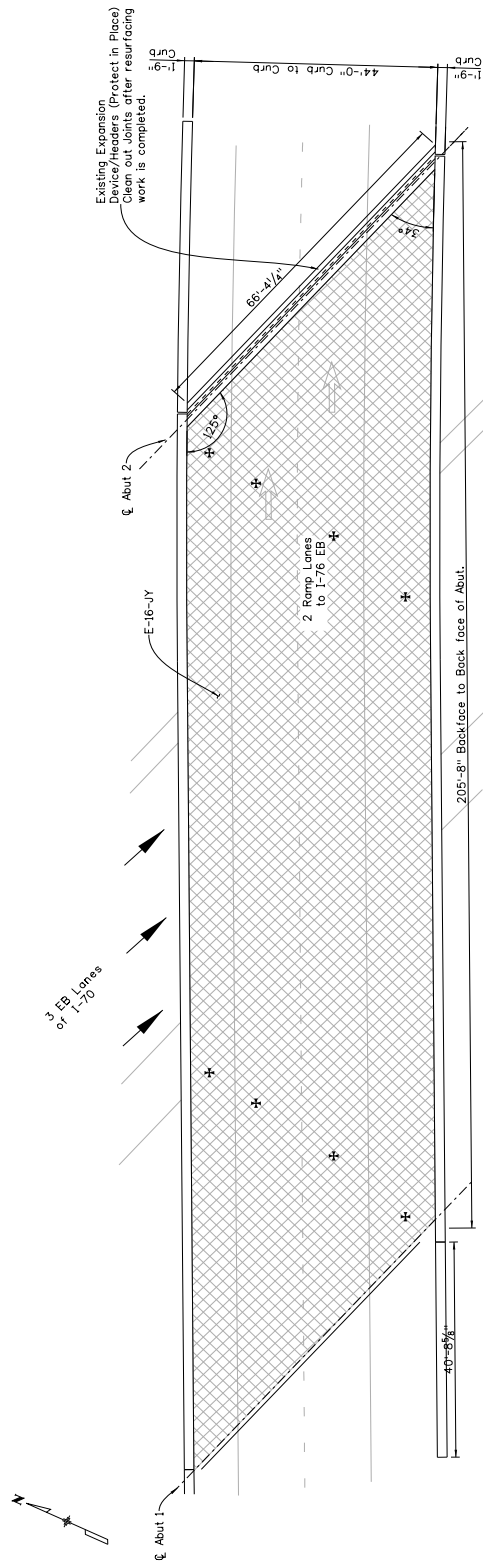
(C)-4 Sample Layout and Details for Deck Rehabilitation Project
